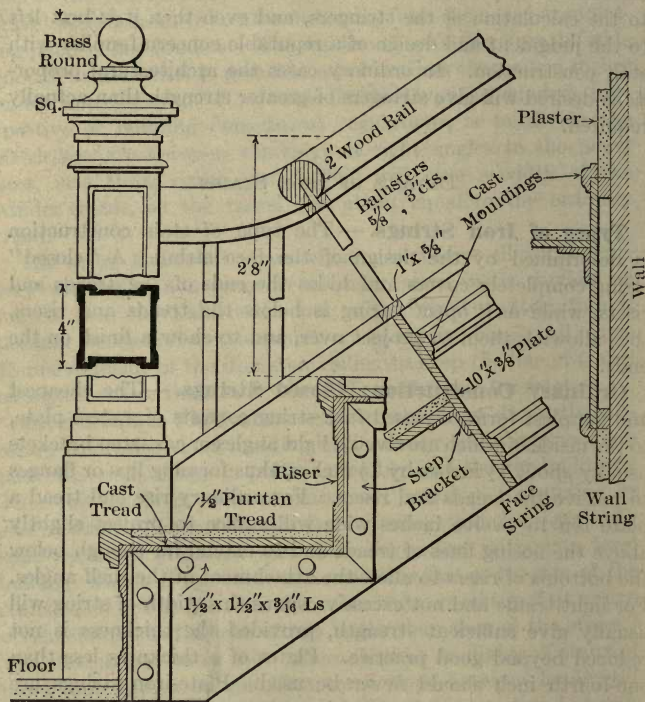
Stairs with Closed Plate String, Perkins Institution for Blind, Watertown, Mass.
